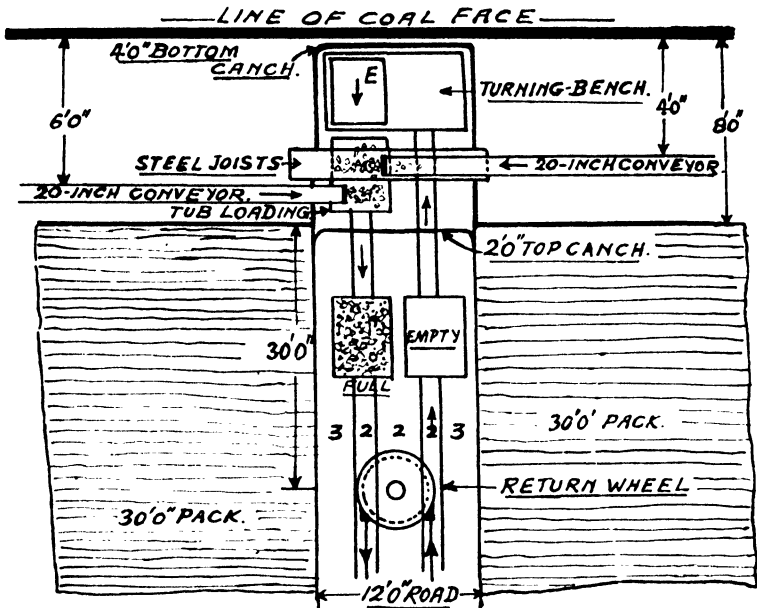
Plan showing Coal-filling Arrangements on Centre Road of Longwall Workings.
